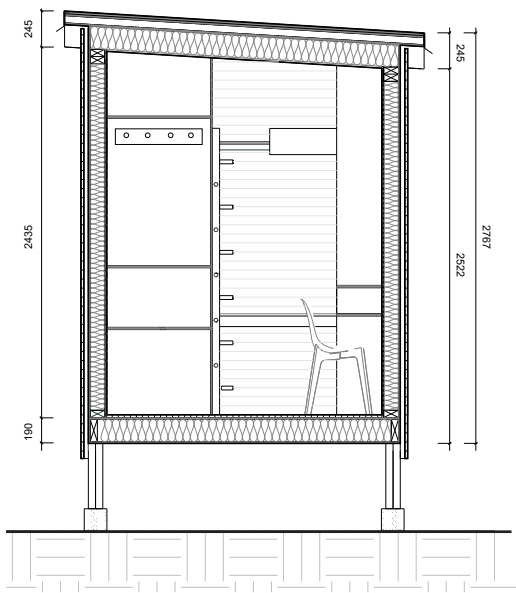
SECTION C-C OF THE BUILT CABIN.
